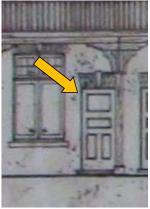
Location of subject doorway opening as shown (arrowed) on the original elevation drawing serving the ground-floor bedroom.
